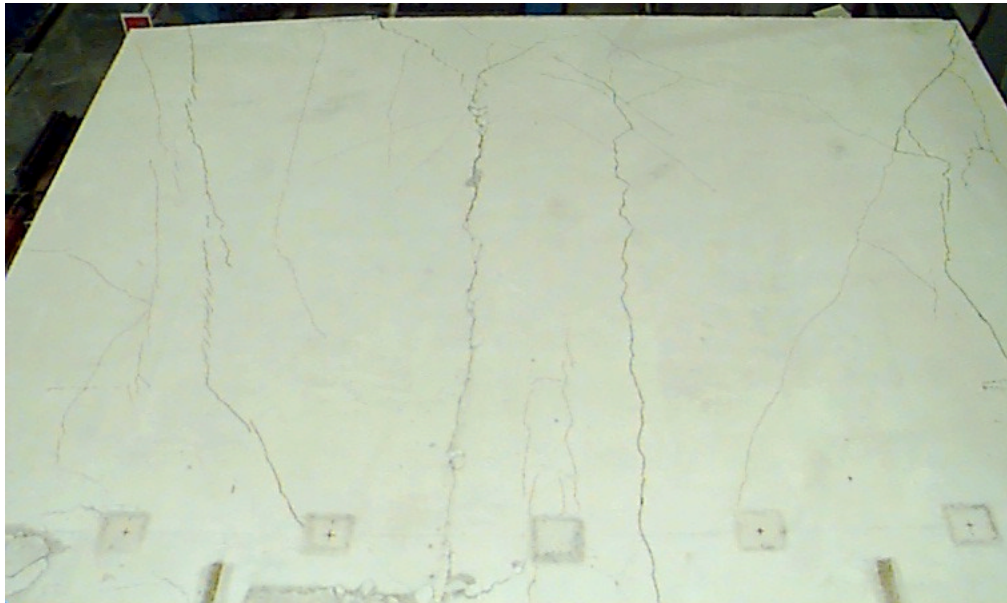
East End Slab Cracking (H-2)
